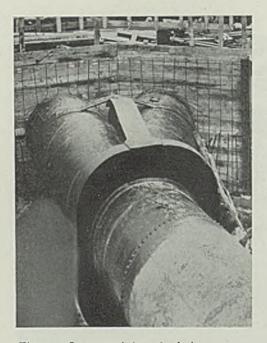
Large reinforced design, arc welded steel Y and reducer section installed in a main mill water line in a Michigan industrial plant
